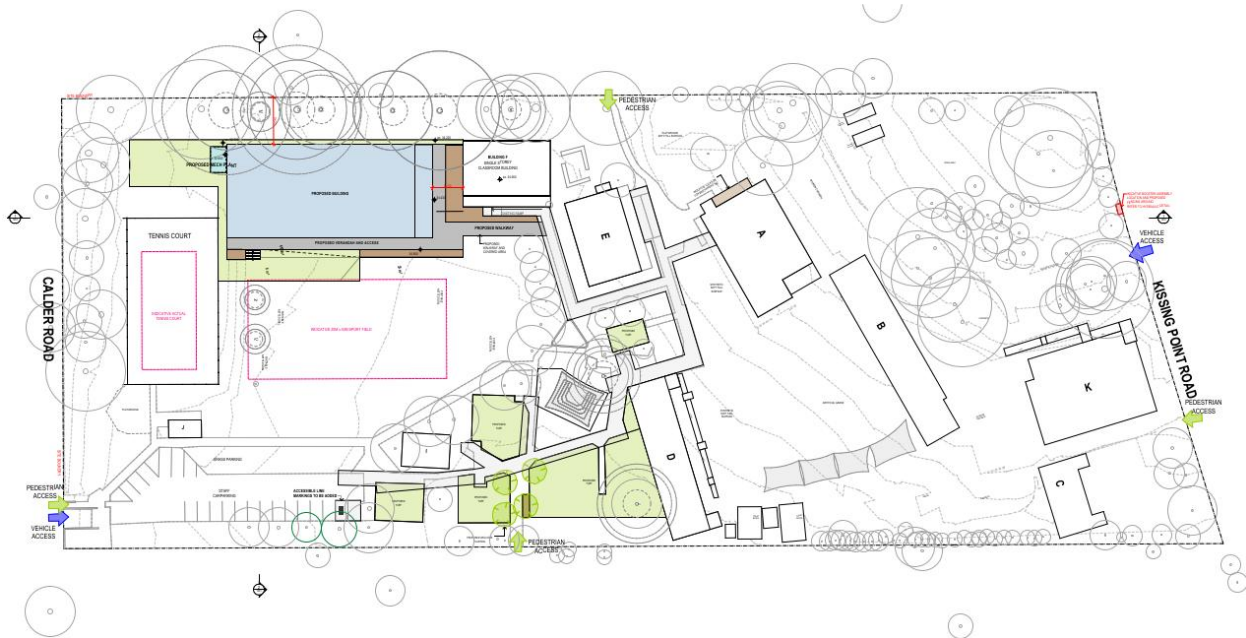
Proposed scope of works (Source: Fulton Trotter Architects, Proposed Site Plan (Rev P5))
